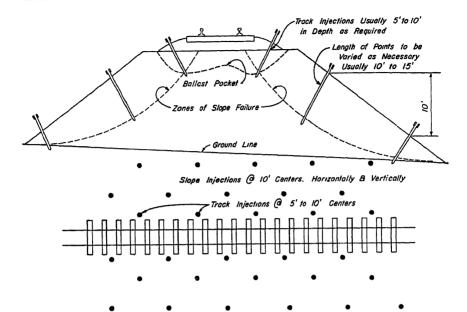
Pressure Grouting. Typical Injection Plan for Fill Slope Foilures.
